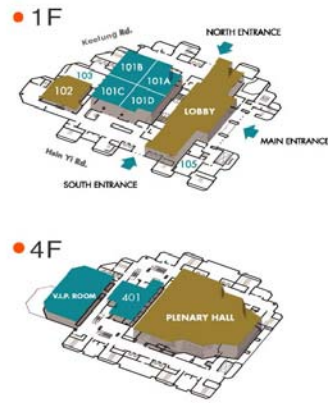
Floor plan of the Taipei International Convention Center (Source: TICC e-brochure)
